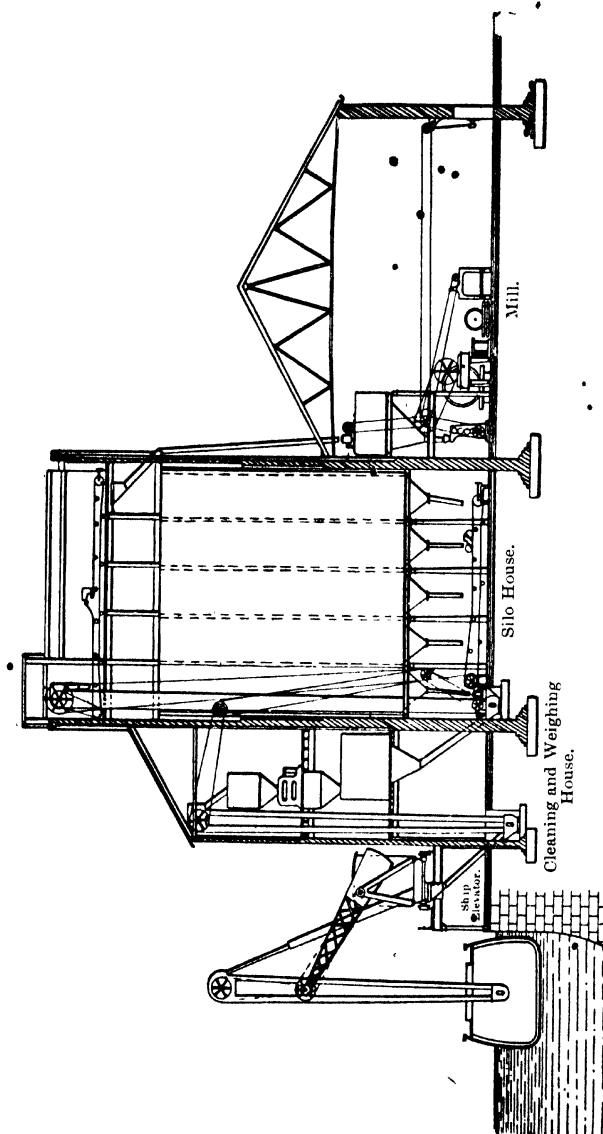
Cross-section showing landing machinery, cleaning machinery, silo house and mill.
